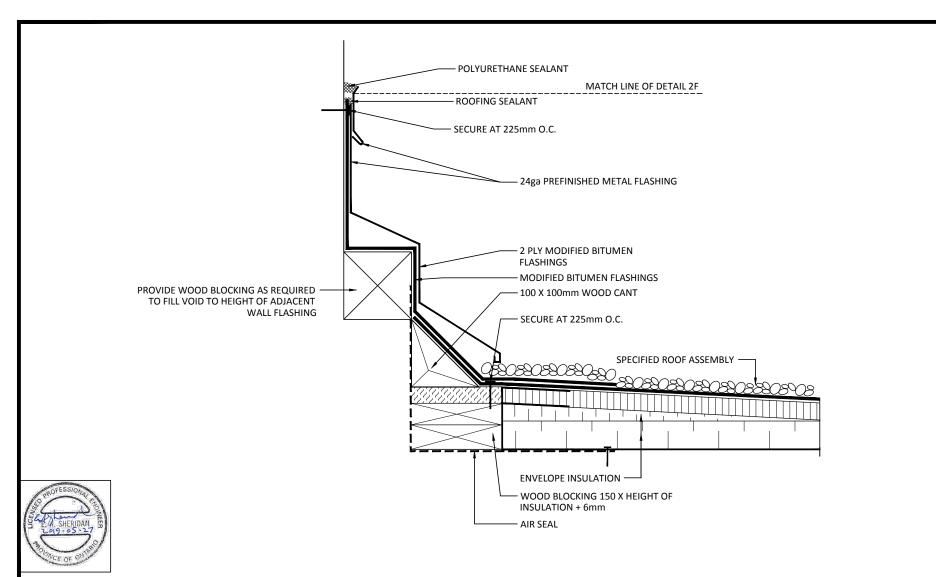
DETAIL NAME: WALL DETAIL			PROJECT NO.: BD18053
